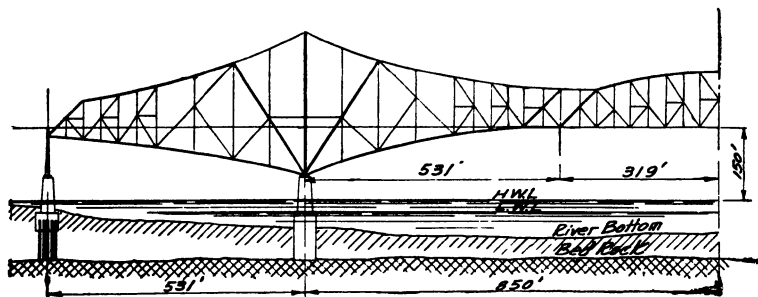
Layout for 1,700-foot Span Cantilever Railway Bridge.
